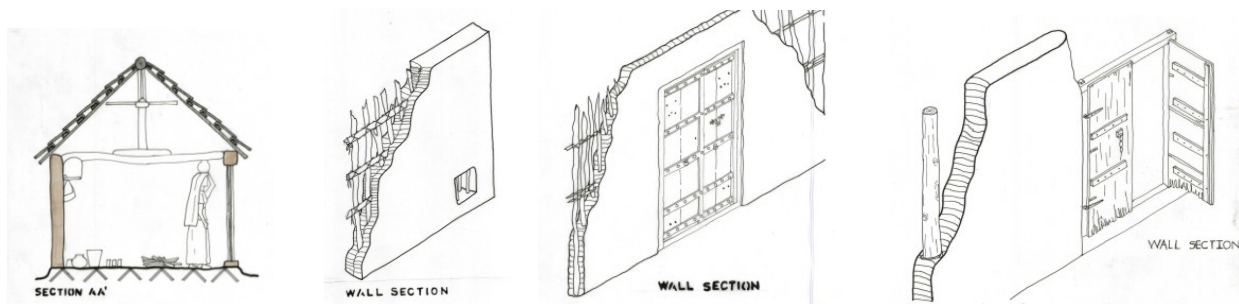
Wall section of houses in Zararwadi in Hodko, Kutch (created by the Author)
